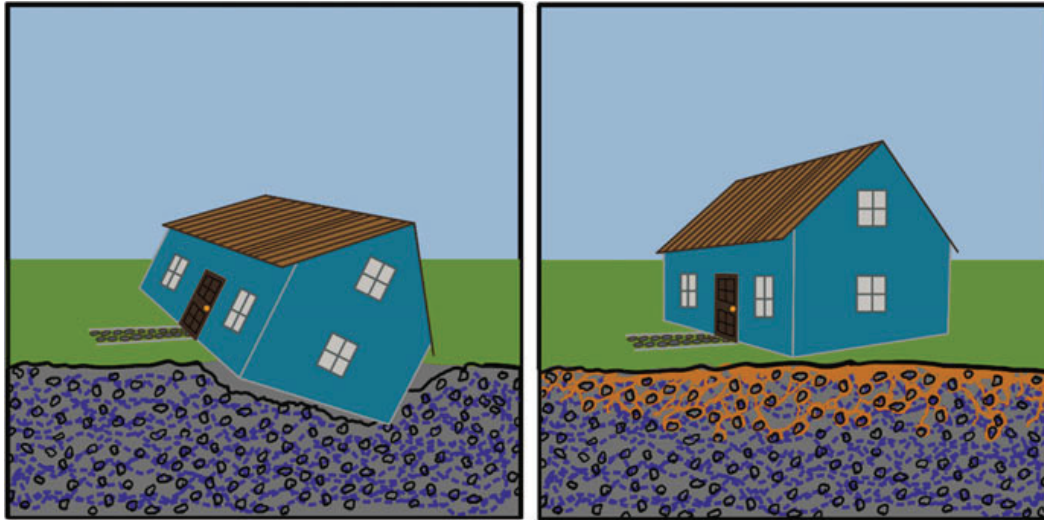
Left, untreated loose soil can cause foundations to fail and structures to be damaged. Right, soil stabilized using engineered biomineralization
